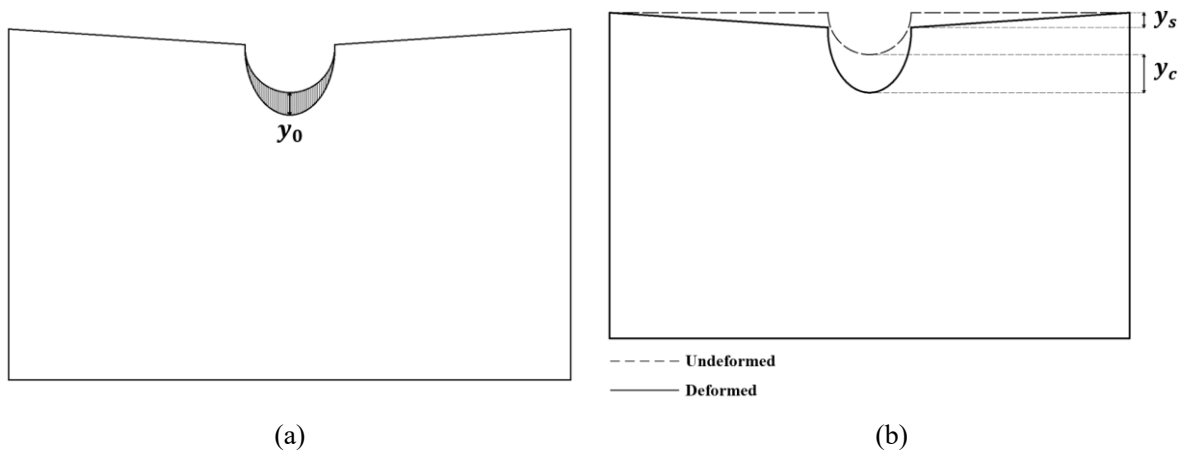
Deformation of the elastic concrete support under vertical load (a) deformed dowel slot, (b)
